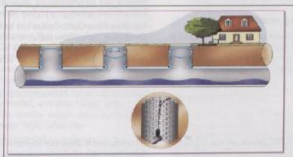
The MCS Drain solution from Coming Cable Systems negates the need for drilling into the sewer wall, as the cable is tensioned between two manholes over guide pulleys which are attached into the manhole wall. Using this installation technique, the possibility of contaminating the groundwater is negated as the integrity of the sewer or drain walling remains intact.
